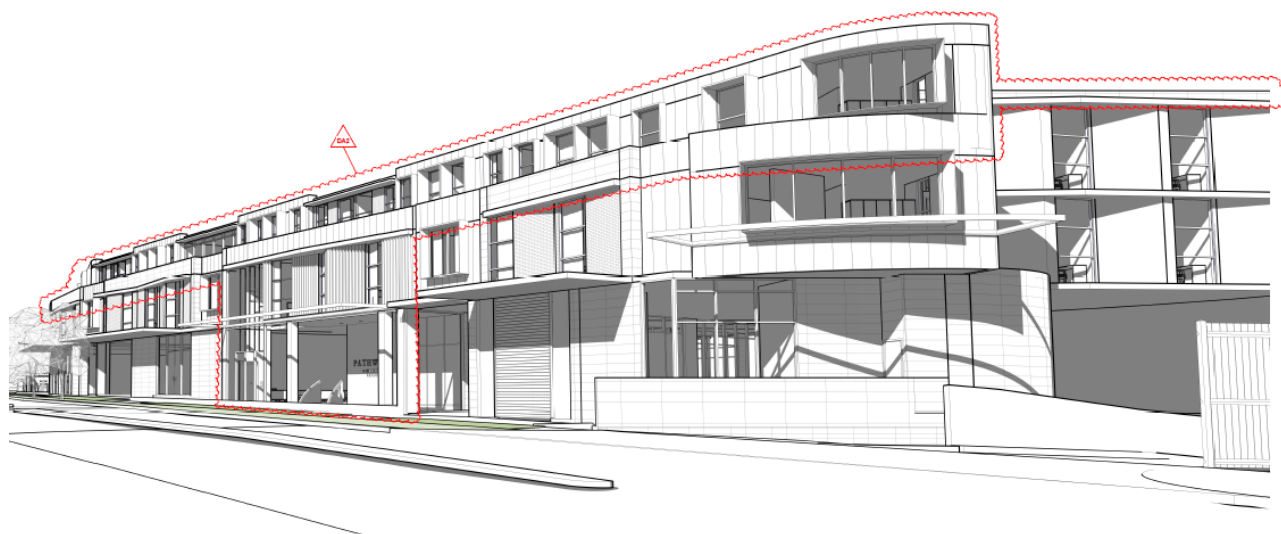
Pedestrian view – opposite Northwood Road looking north (Source: Drawing DA505, Revision DA2, MDP Architects).
